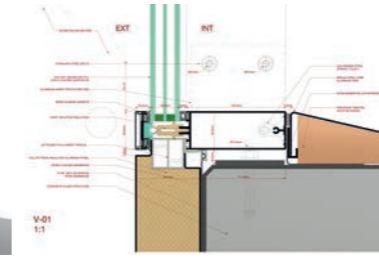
Typical stick curtain wall sill section detail drawn at 1:1. (drawn by Spencer Culhane)
